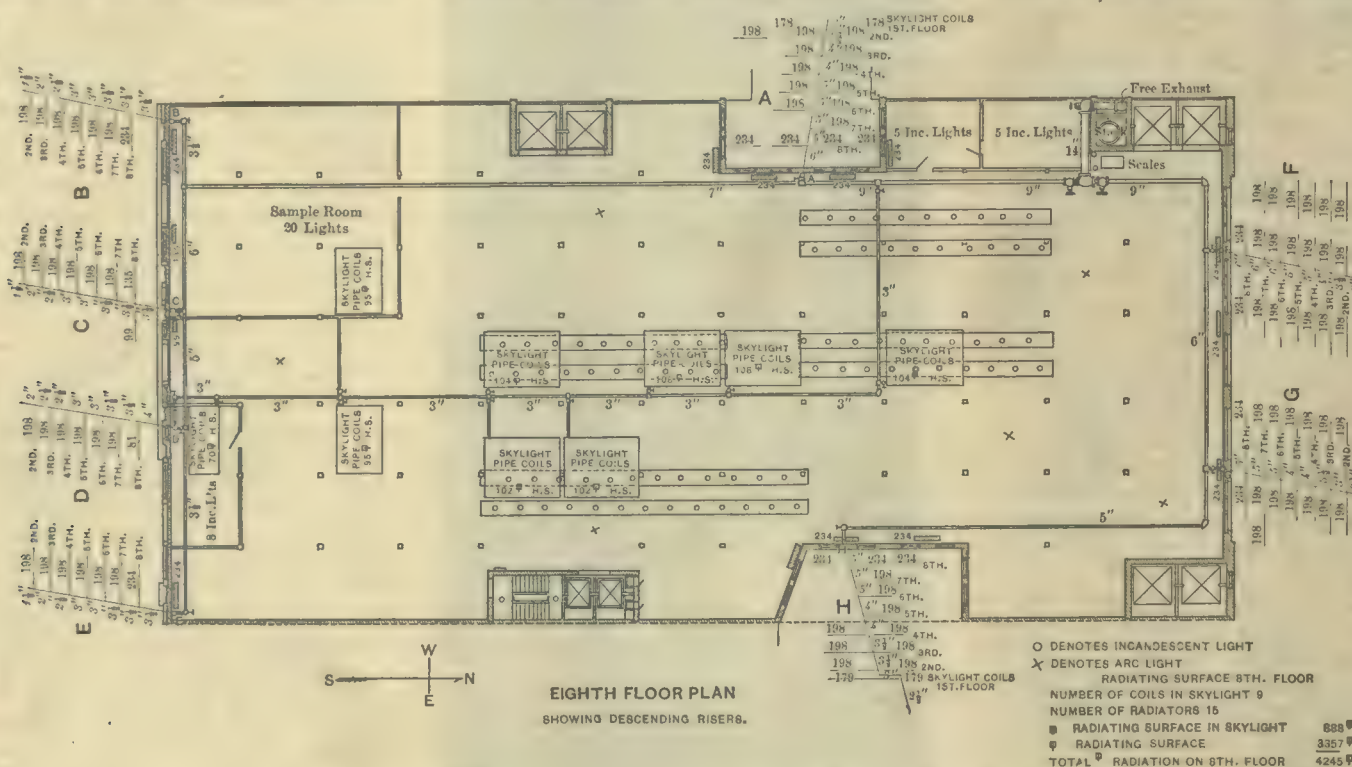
MECHANICAL PLANT OF A MODERN COMMERCIAL BUILDING.
